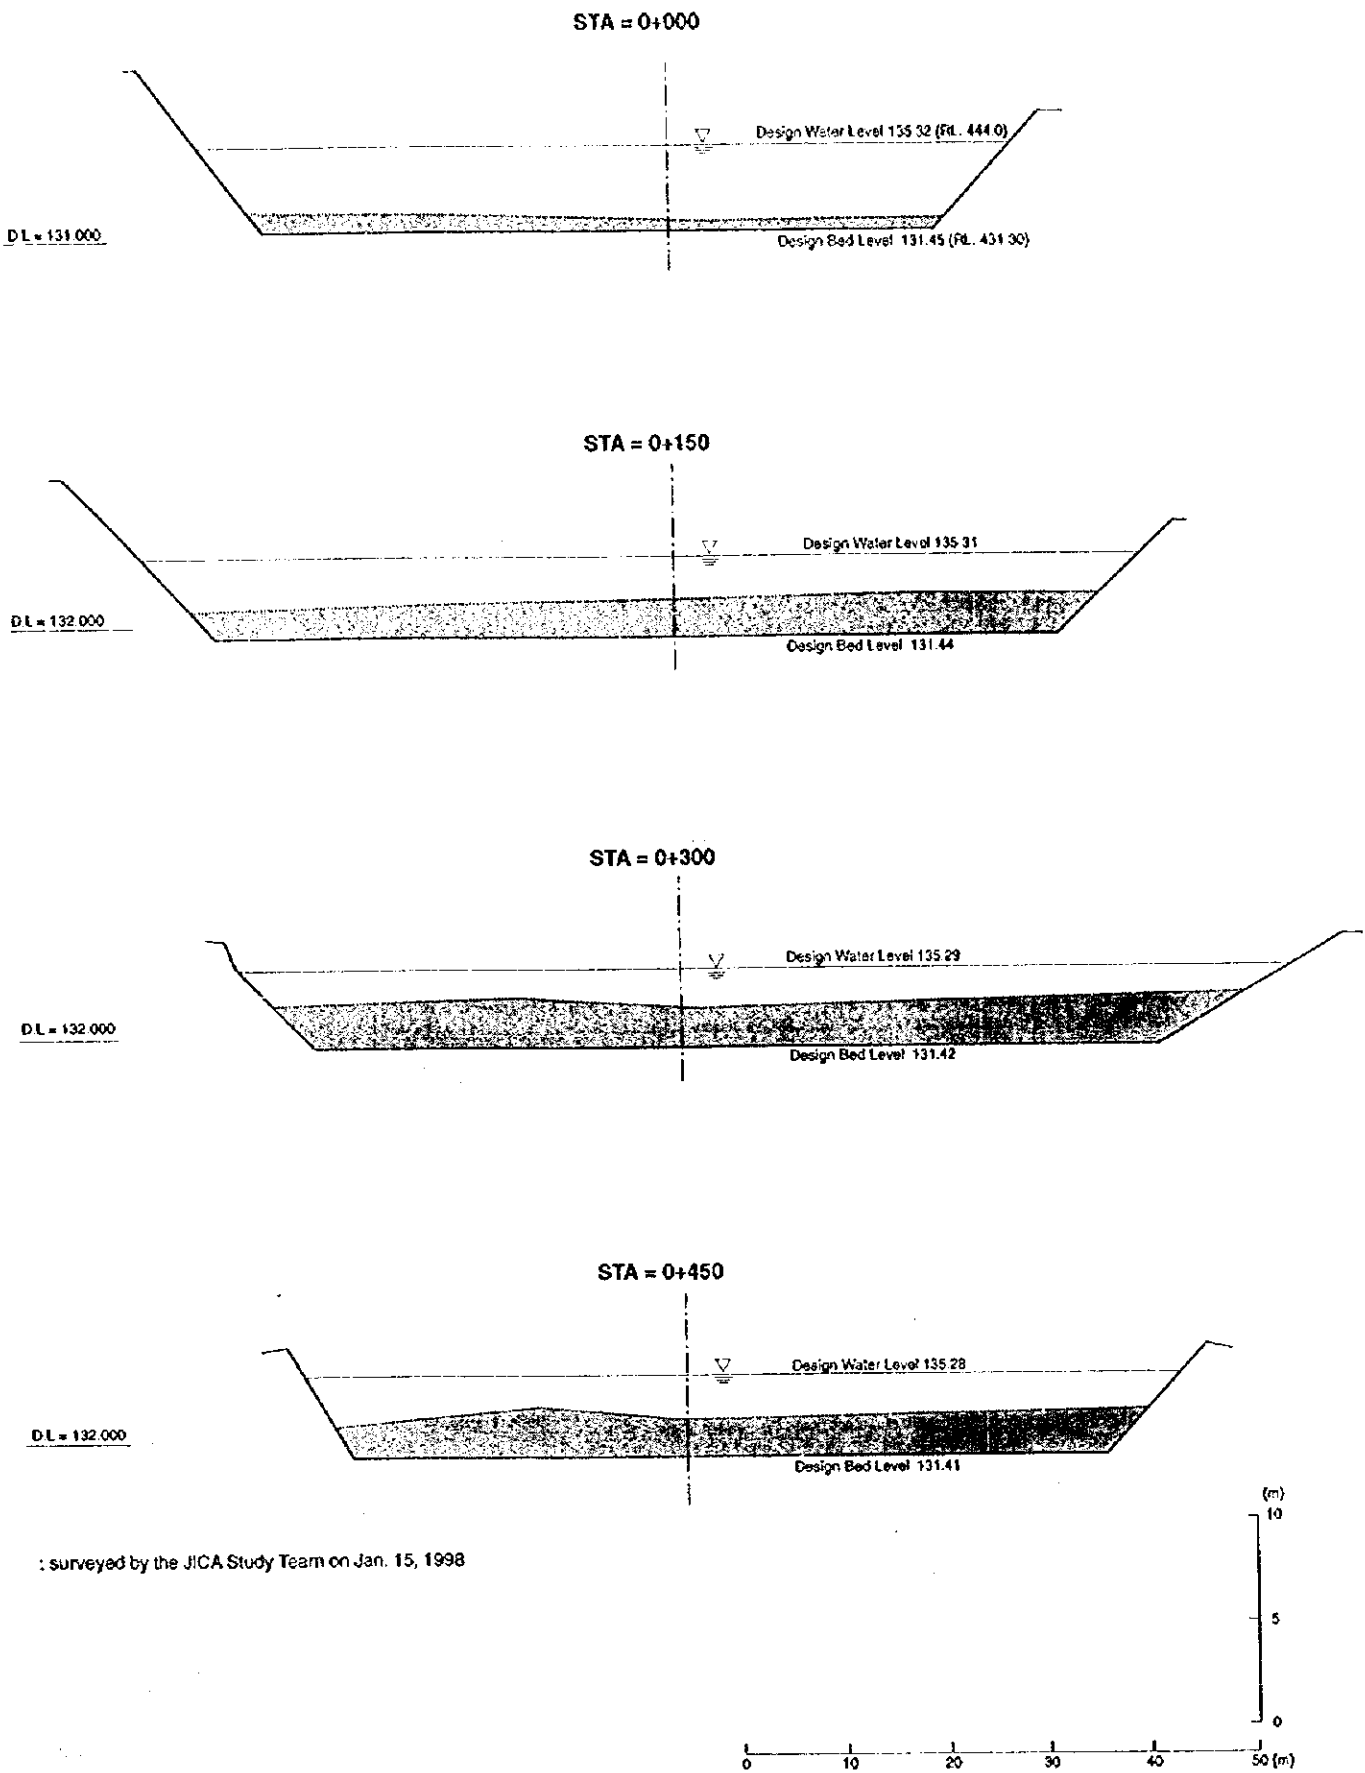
Cross Section of D.G. Khan Canal at Taunsa Barrage (1/4)
